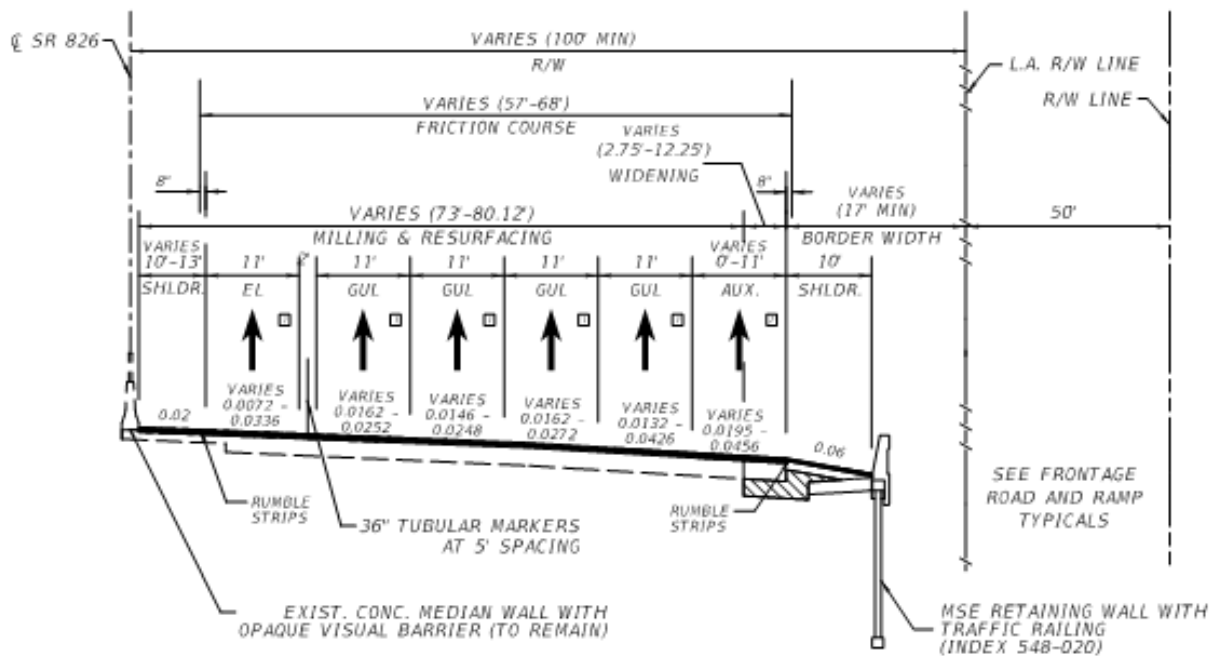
2: Proposed SR 826 Northbound Typical Section
